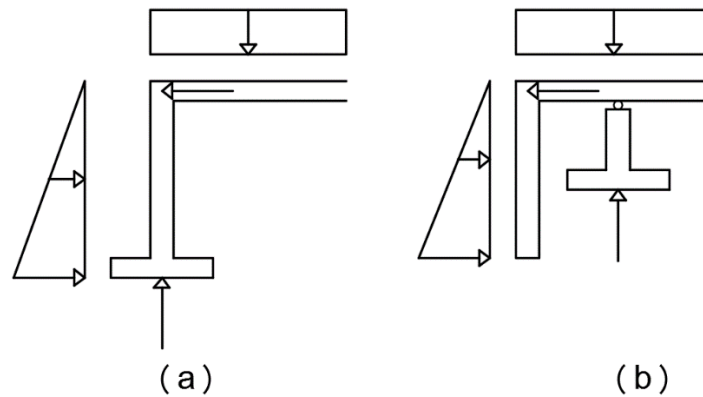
Conceptual load bearing of (a) a frame bridge with spread foundation, or a fully integrated bridge with pile foundation, where both horizontal and vertical forces are taken by the frame legs and (b) semi-integrated abutment bridge with backwall where the vertical forces are taken by adjacent piers and the horizontal forces are taken by the backwall.
